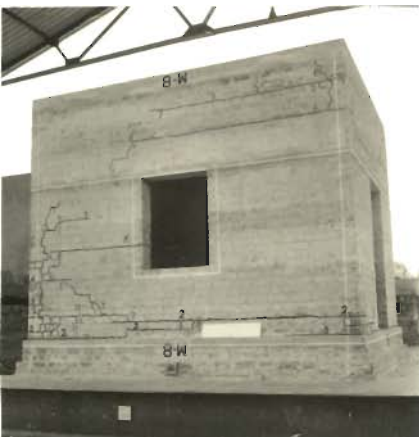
\_ TOP SPANDREL OF LEFT PIER OF WEST WALL (MODEL 8 )
